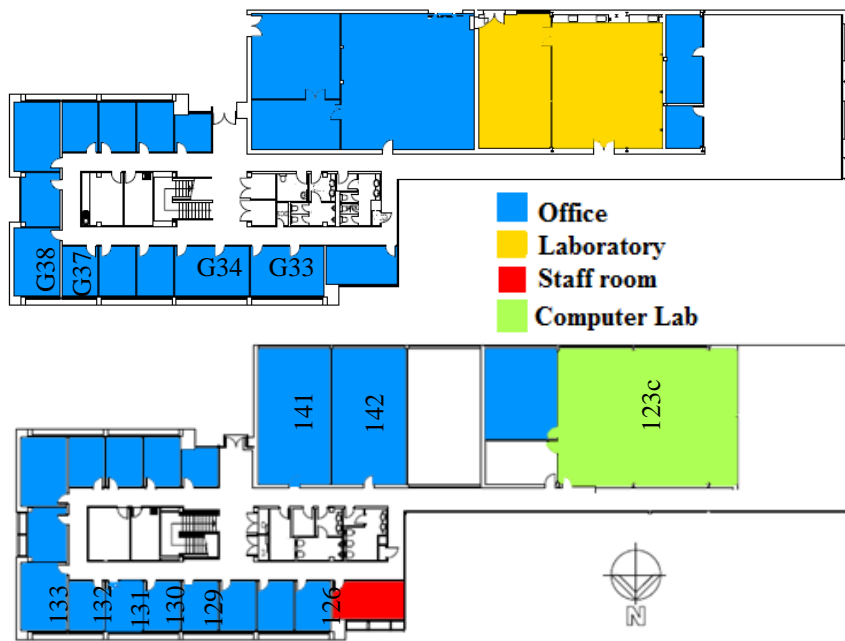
Floor plan of the ground floor (upper) and first floor (lower) of the modelled east wing of Building 4 - coloured according to their functions.
